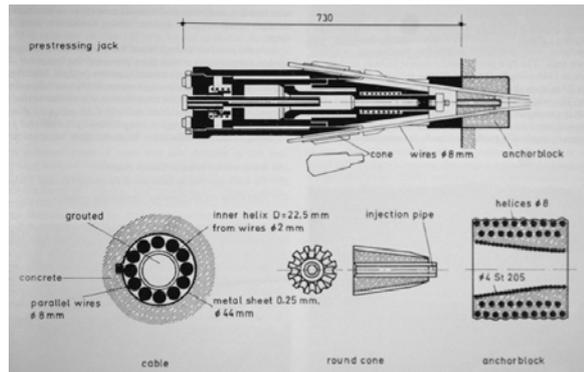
Freyssinet's prestressing tendon anchorage system with conical wedge. (Wittfoht)
